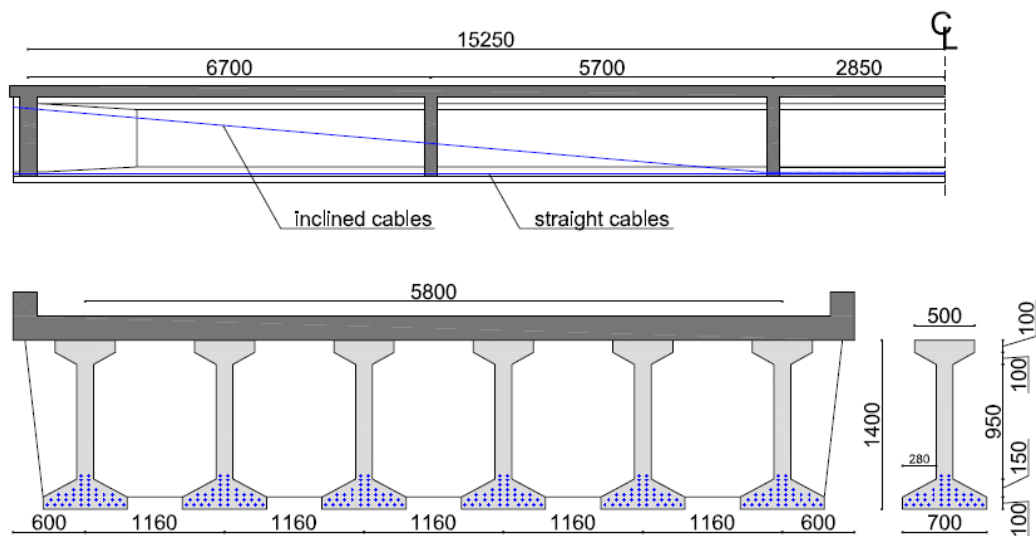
a) Longitudinal and b) transversal scheme of existing bridge
